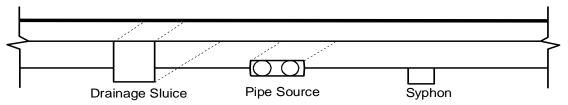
A schematic view of Drainage sluice, pipe sluice and siphon on embankment which relieve drainage congestion.
